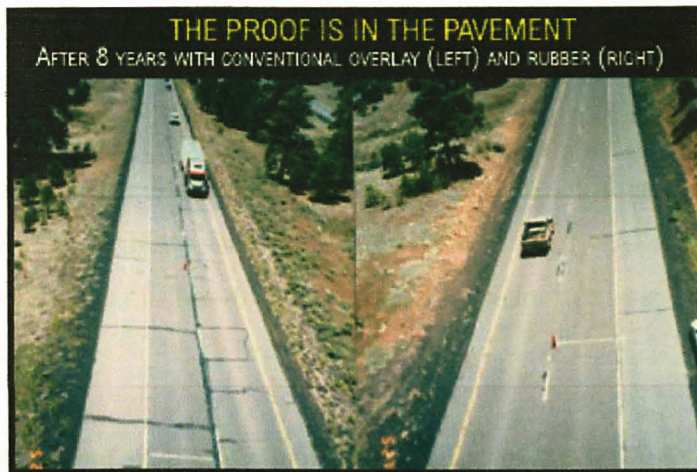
Differences between unmodified asphalt pavements and rubber modified asphalt pavements
